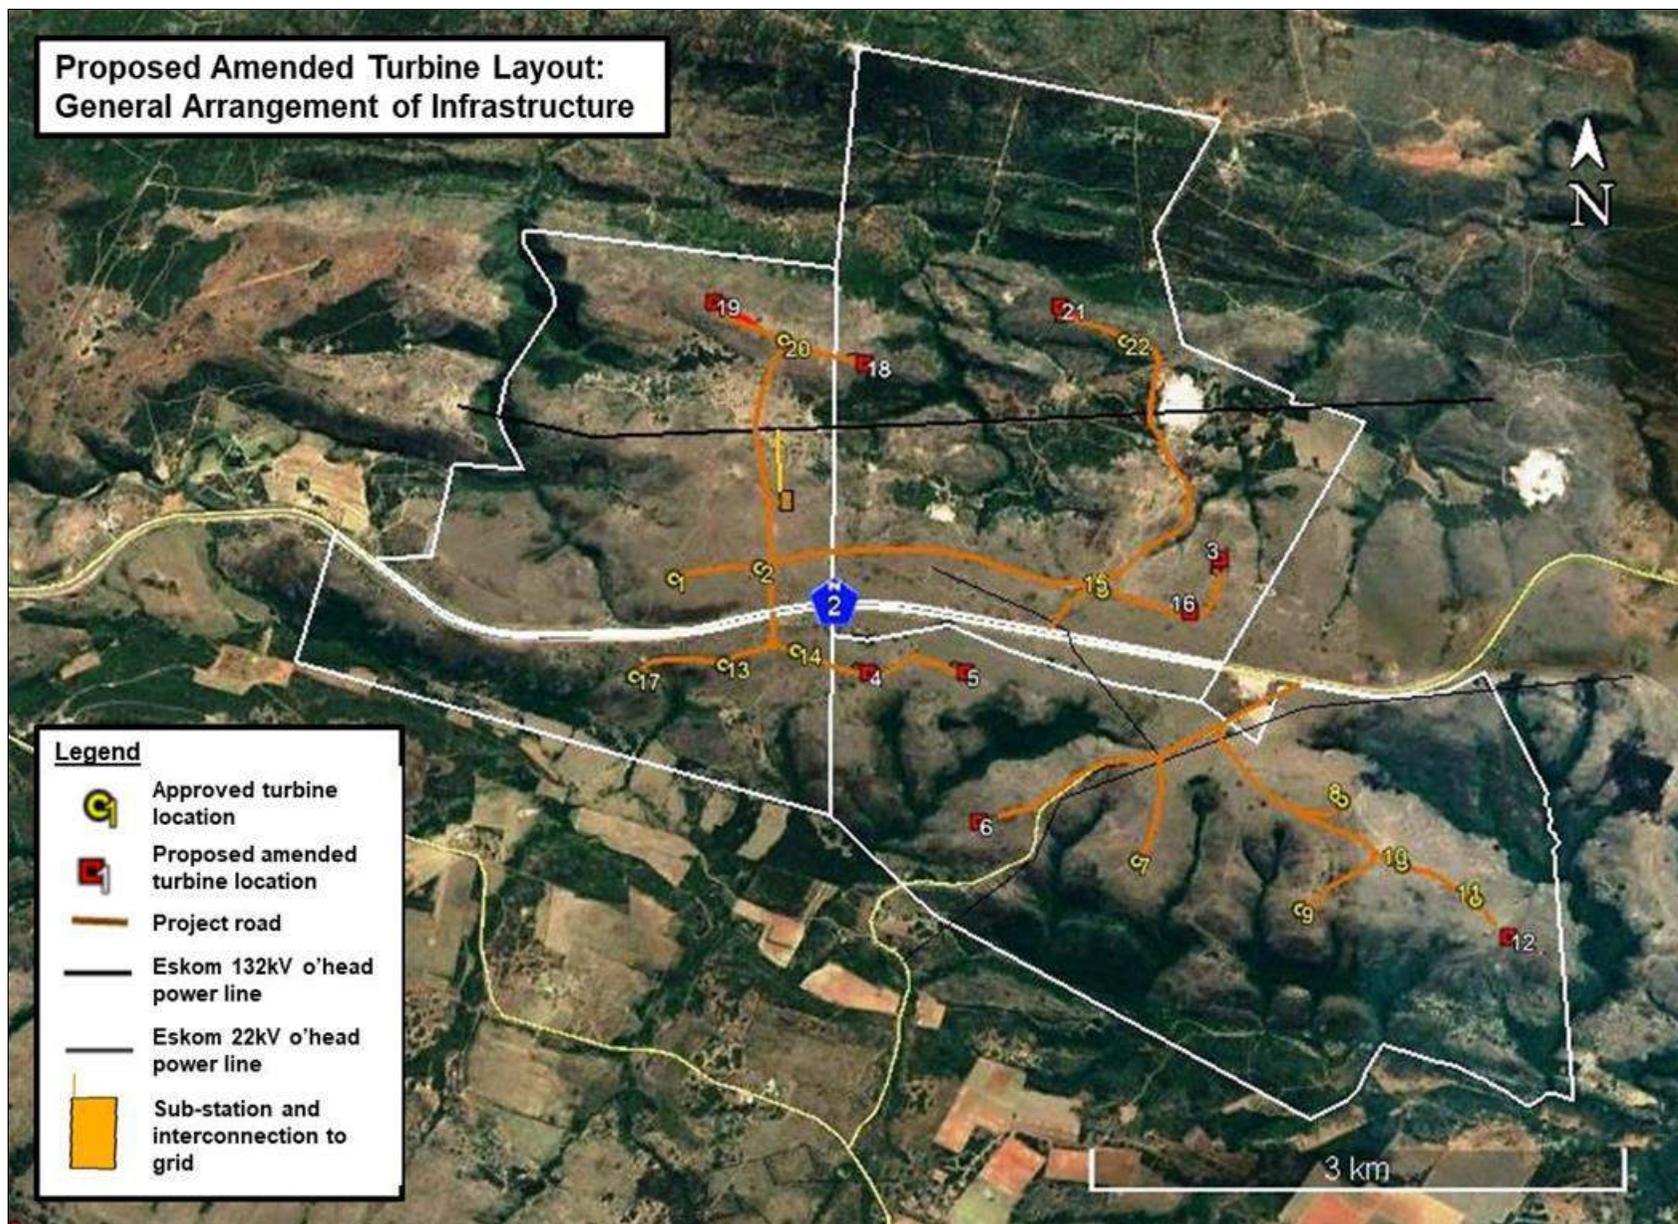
Proposed amended layout of turbines, roads, substation and interconnection to the grid
